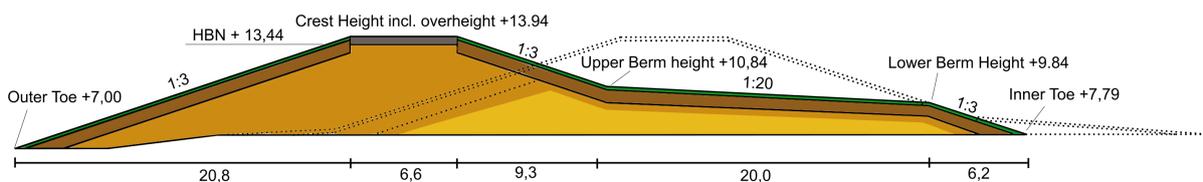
Conceptual design alternative of outward dike reinforcement
